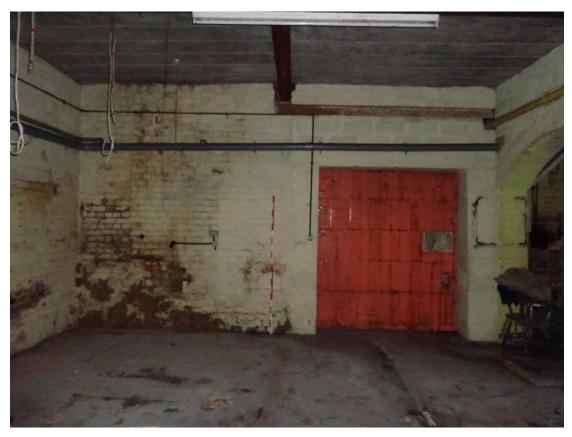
; West end of former yard showing blocked opening (?for machine-belt) at north end of building 8
